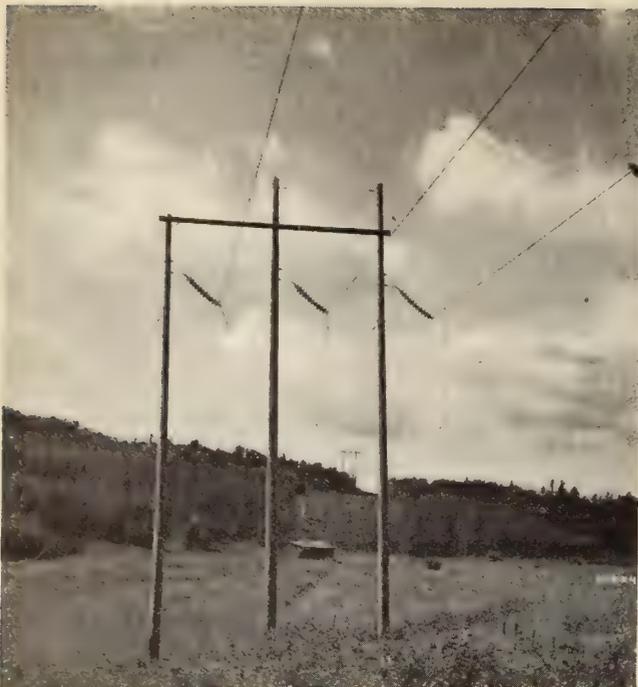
Typical semi anchor structure—Steep Rock Line.
